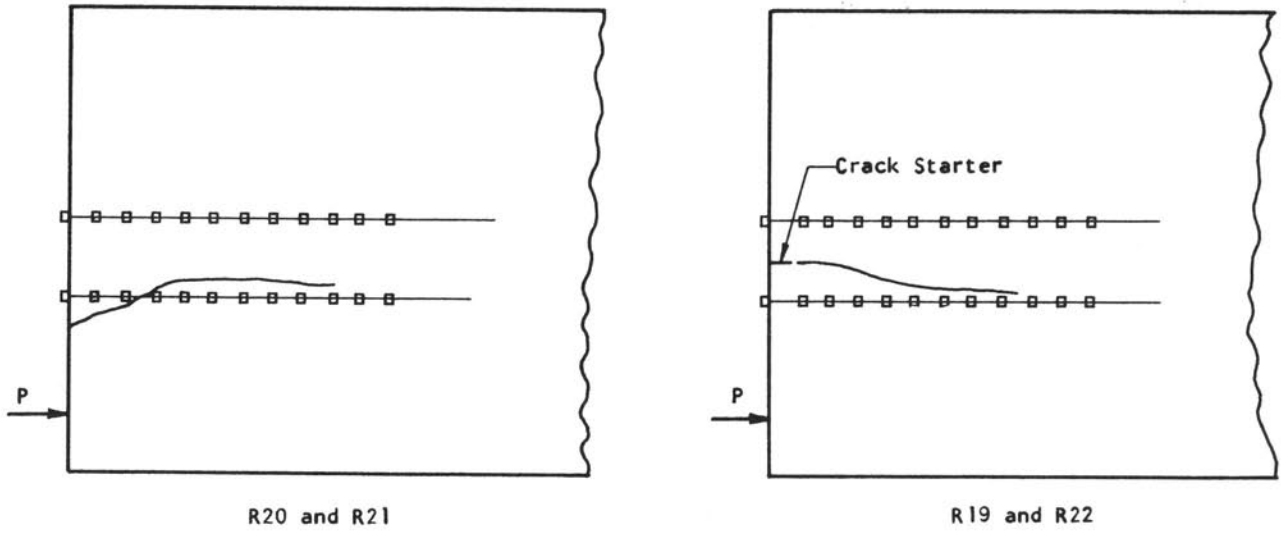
CRACK LOCATIONS FOR SPECIMENS WITH AND WITHOUT A CRACK STARTER
